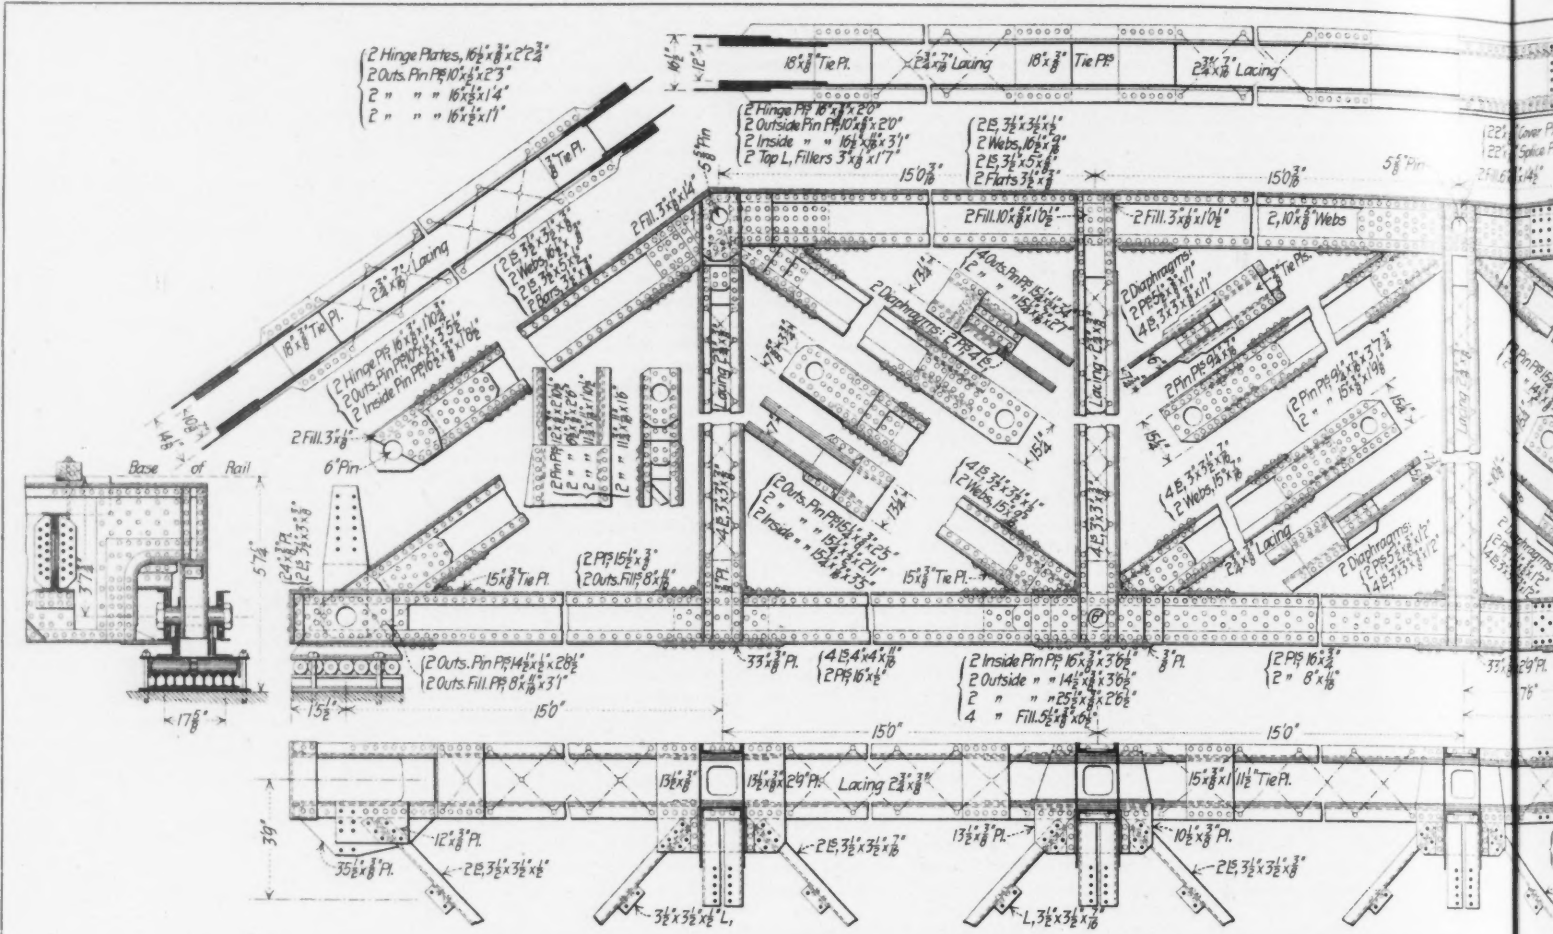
ELEVATION, PLANS AND SECTIONS OF 120-FT. PONY TRUSS.
